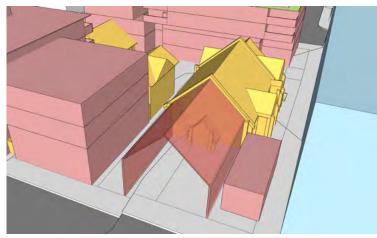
SGL 3D modelling of Planning Proposal showing the possible location and scale of the current proposed "Covered Space" on the Church frontage to East Street
